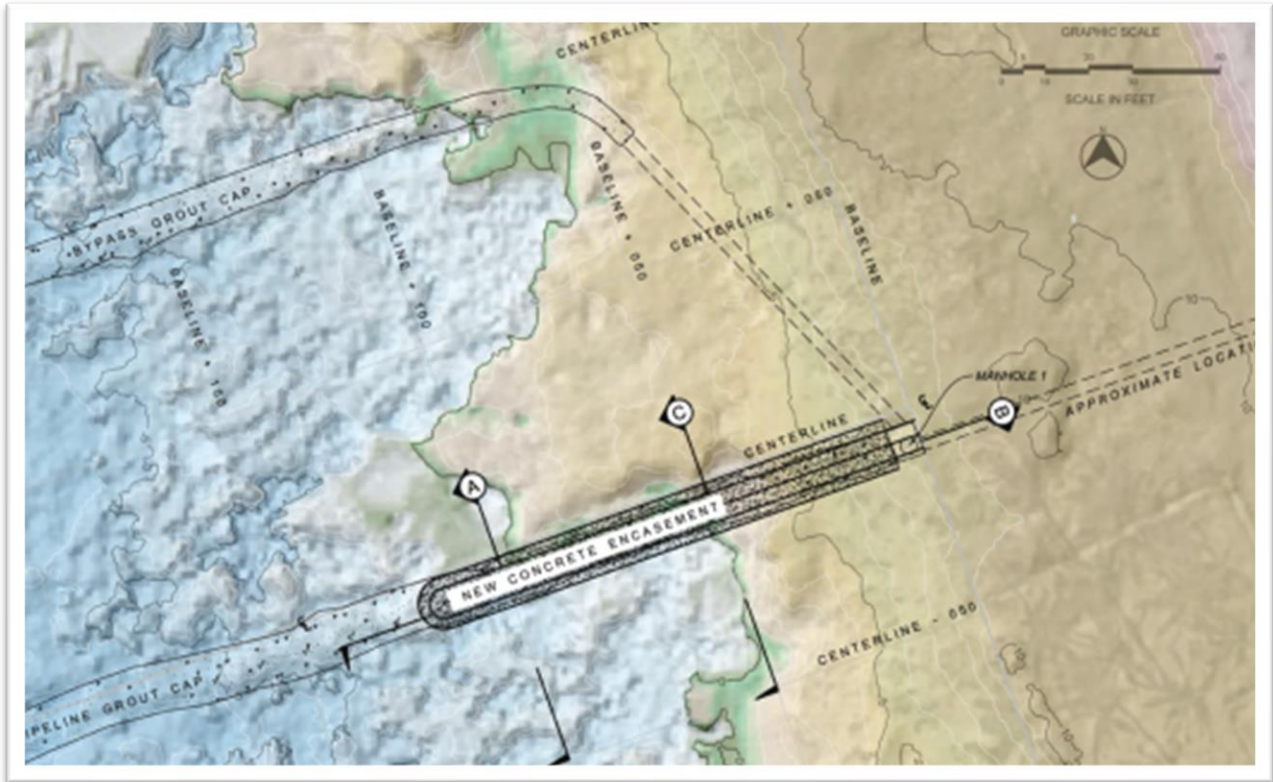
Plan View of the Proposed Concrete Encasement Structure
